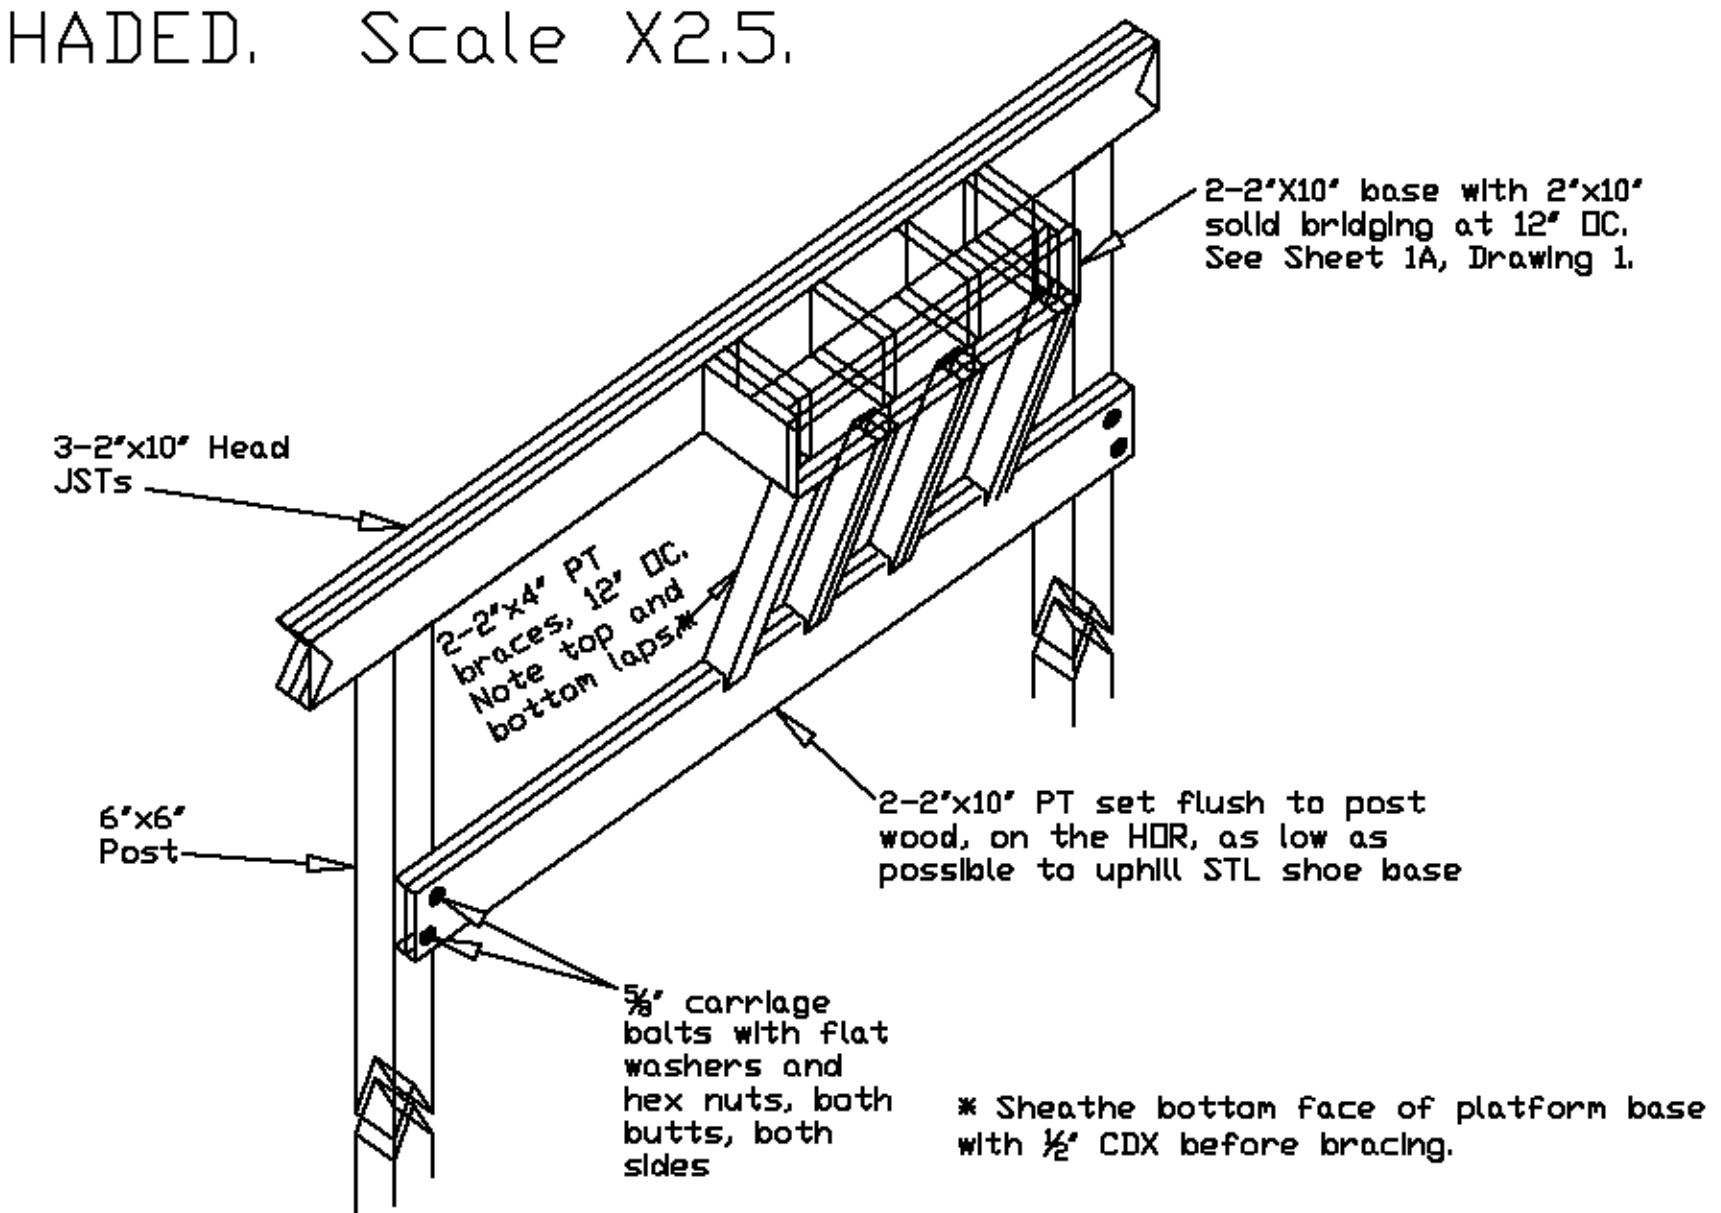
FIREPLACE CHASE AND PLATFORM FRAMING, ISOMETRIC, COMBINATION WIREFRAME AND SHADED, Scale X3.
